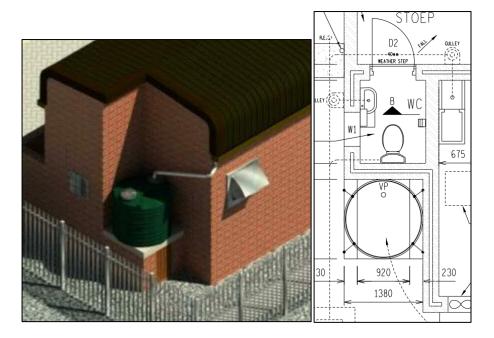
Perspective and plan views of rainwater storage tank and adjacency to Ablution and Battery Room
